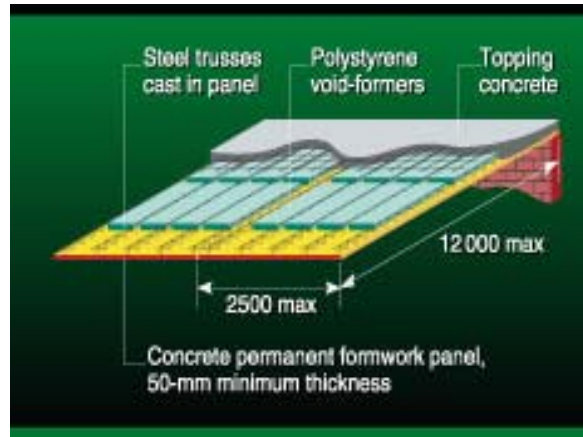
'Transfloor' precast permanent formwork system. [39]
